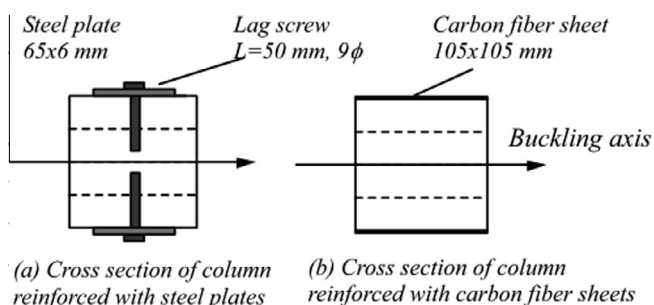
Section of the columns reinforced by steel plates and carbon fibre sheets [6].
